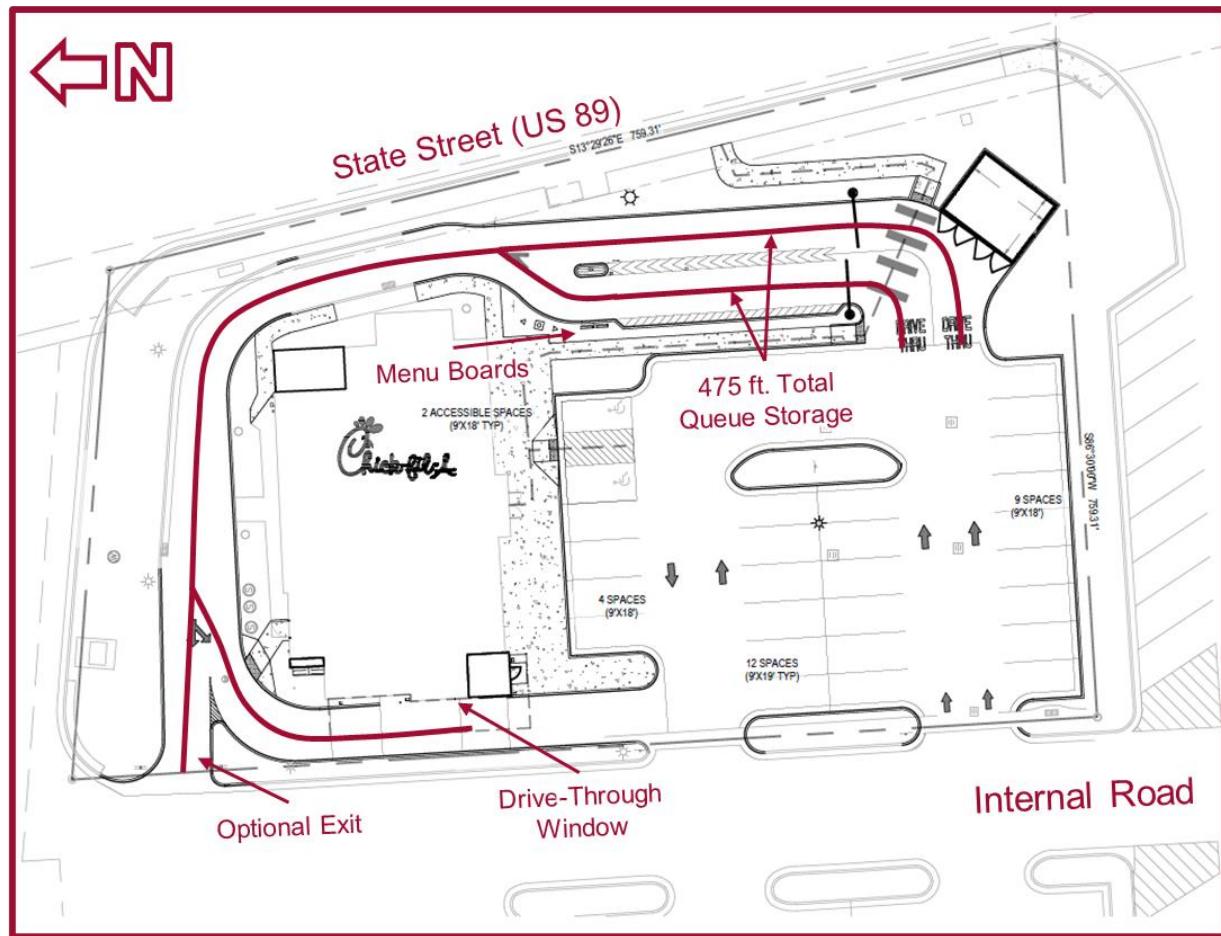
Drive-Through Queue Storage with Proposed Expansion and Site Improvements
